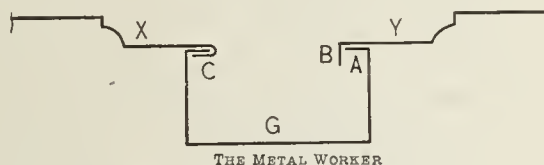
Locking the Panels.—Section through X Y in Fig. 1.
